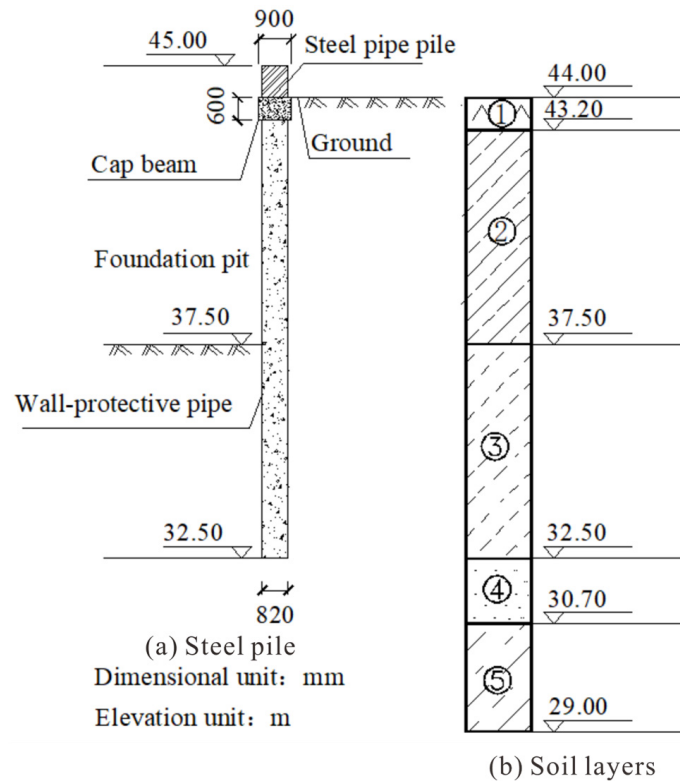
Cross-sectional graph of the supporting structure. (a) Steel pipe; (b) soil layers.
